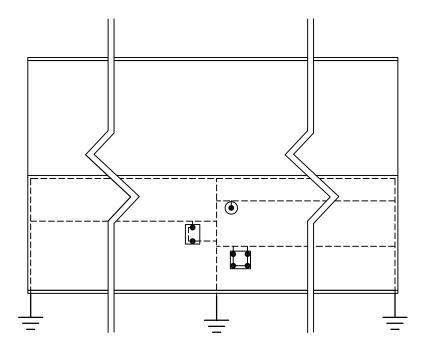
(b) Lower Roof Protection Provided by Pitched-Roof Buildings 25 ft (7.6 m) or Less in Height.
